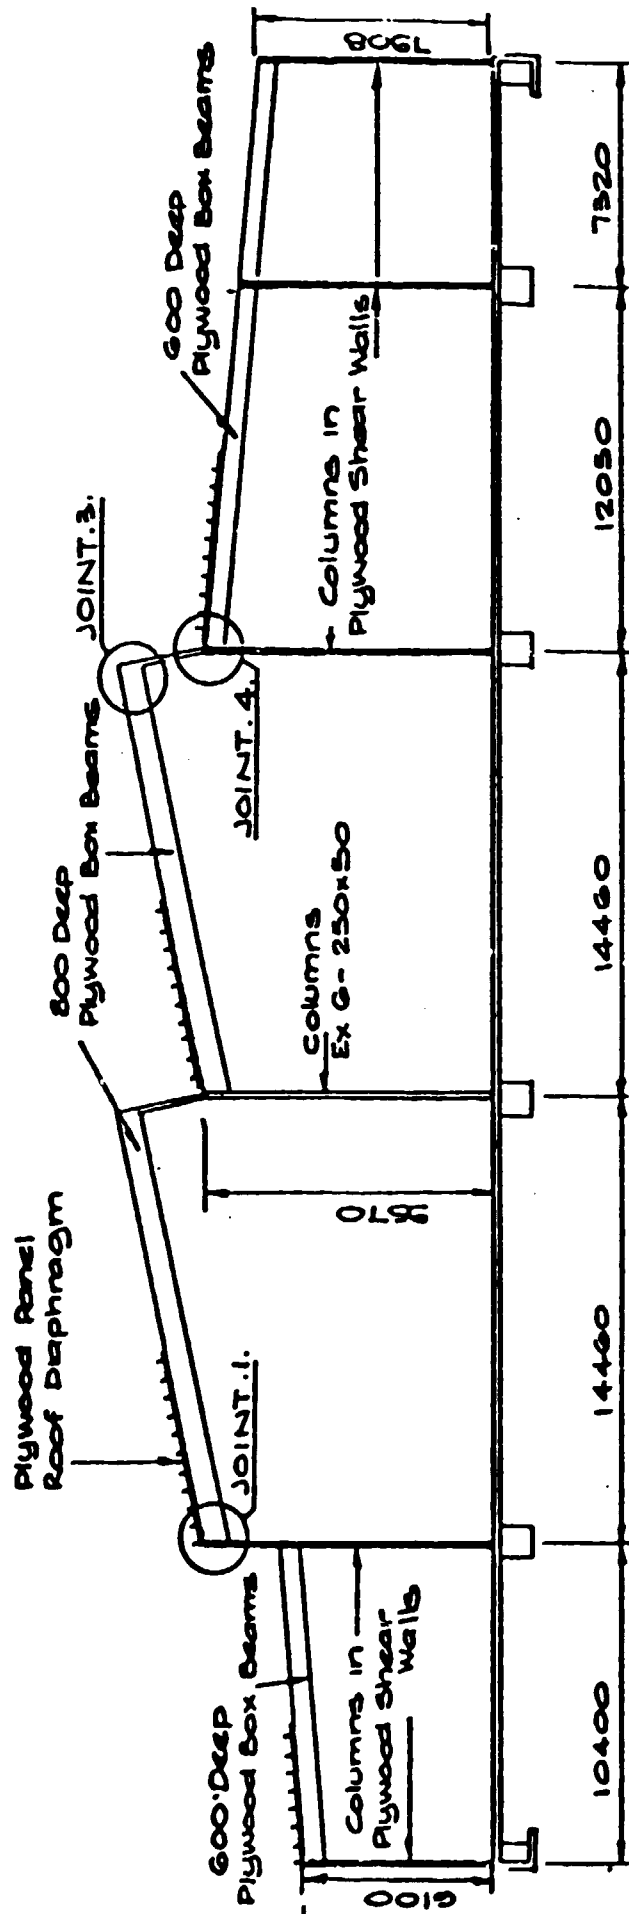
WAREHOUSE STRUCTURAL FRAME - CROSS SECTION
